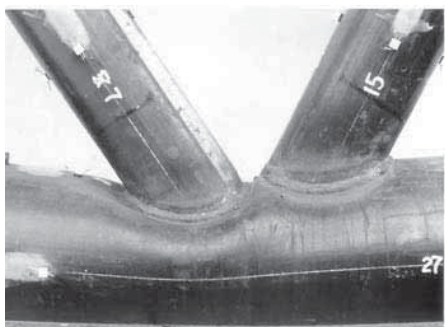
Chord wall plastification for rectangular HSS gapped K-connections.
